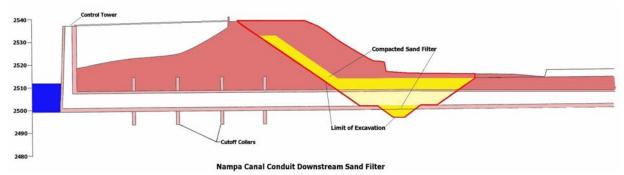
Cross section of proposed excavation and downstream sand filter for Nampa Canal outlet
